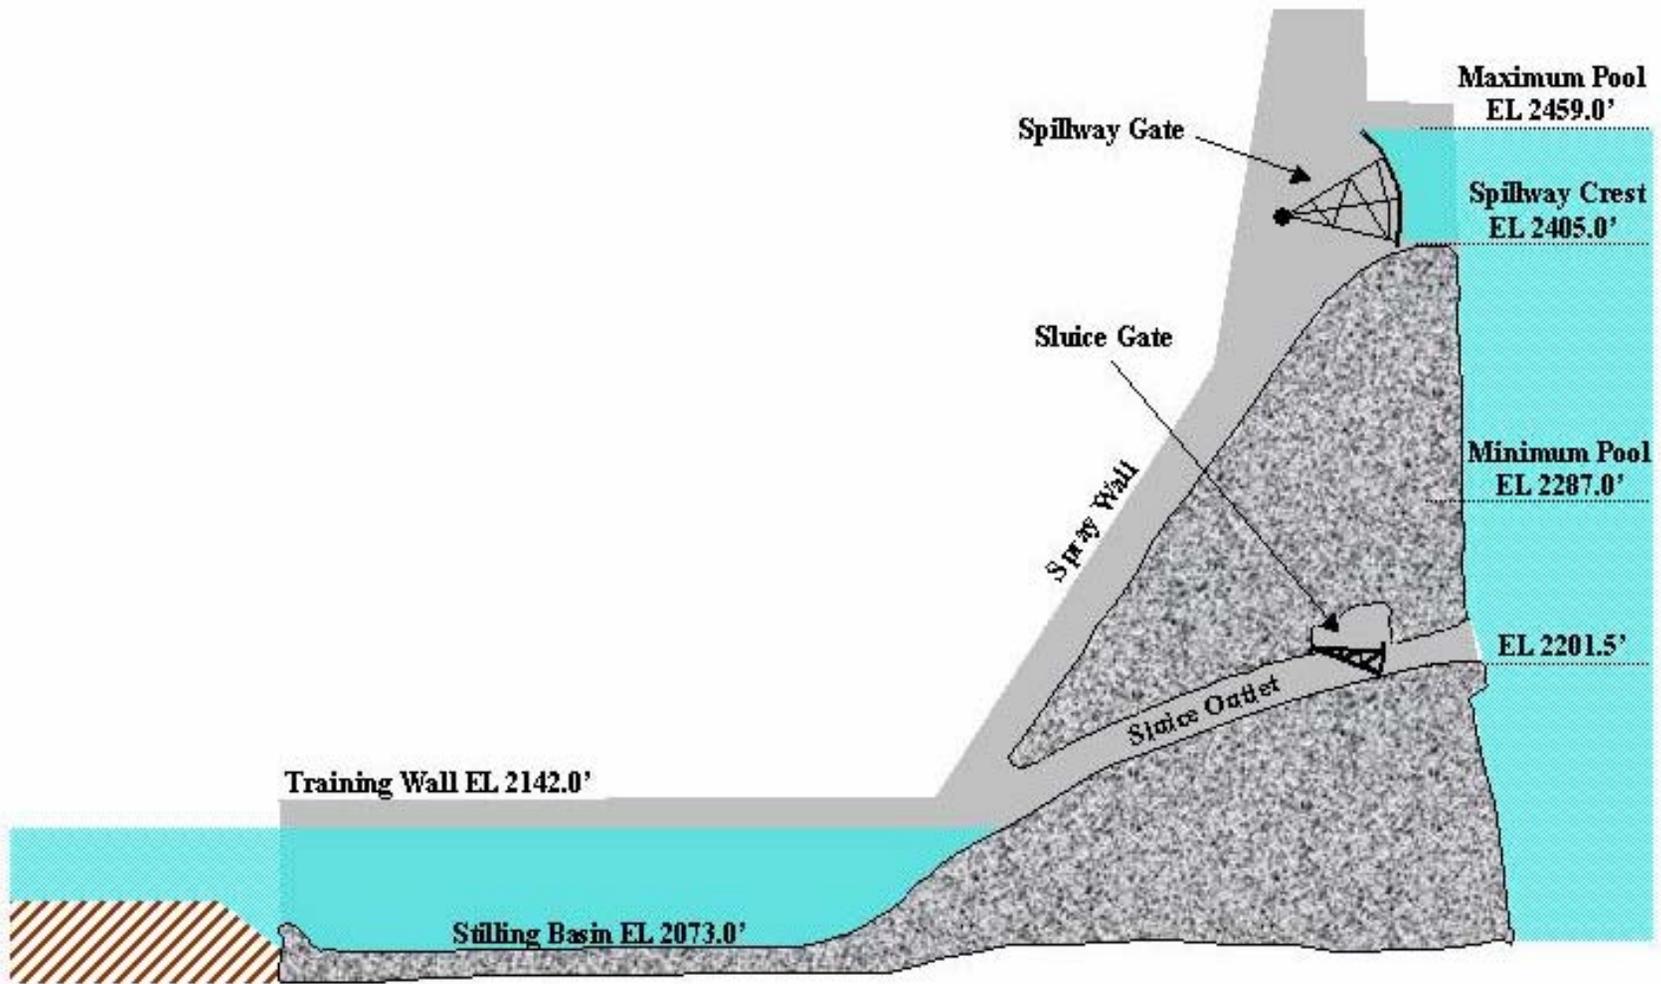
Cross Sectional Details of Spillway and Sluiceways
